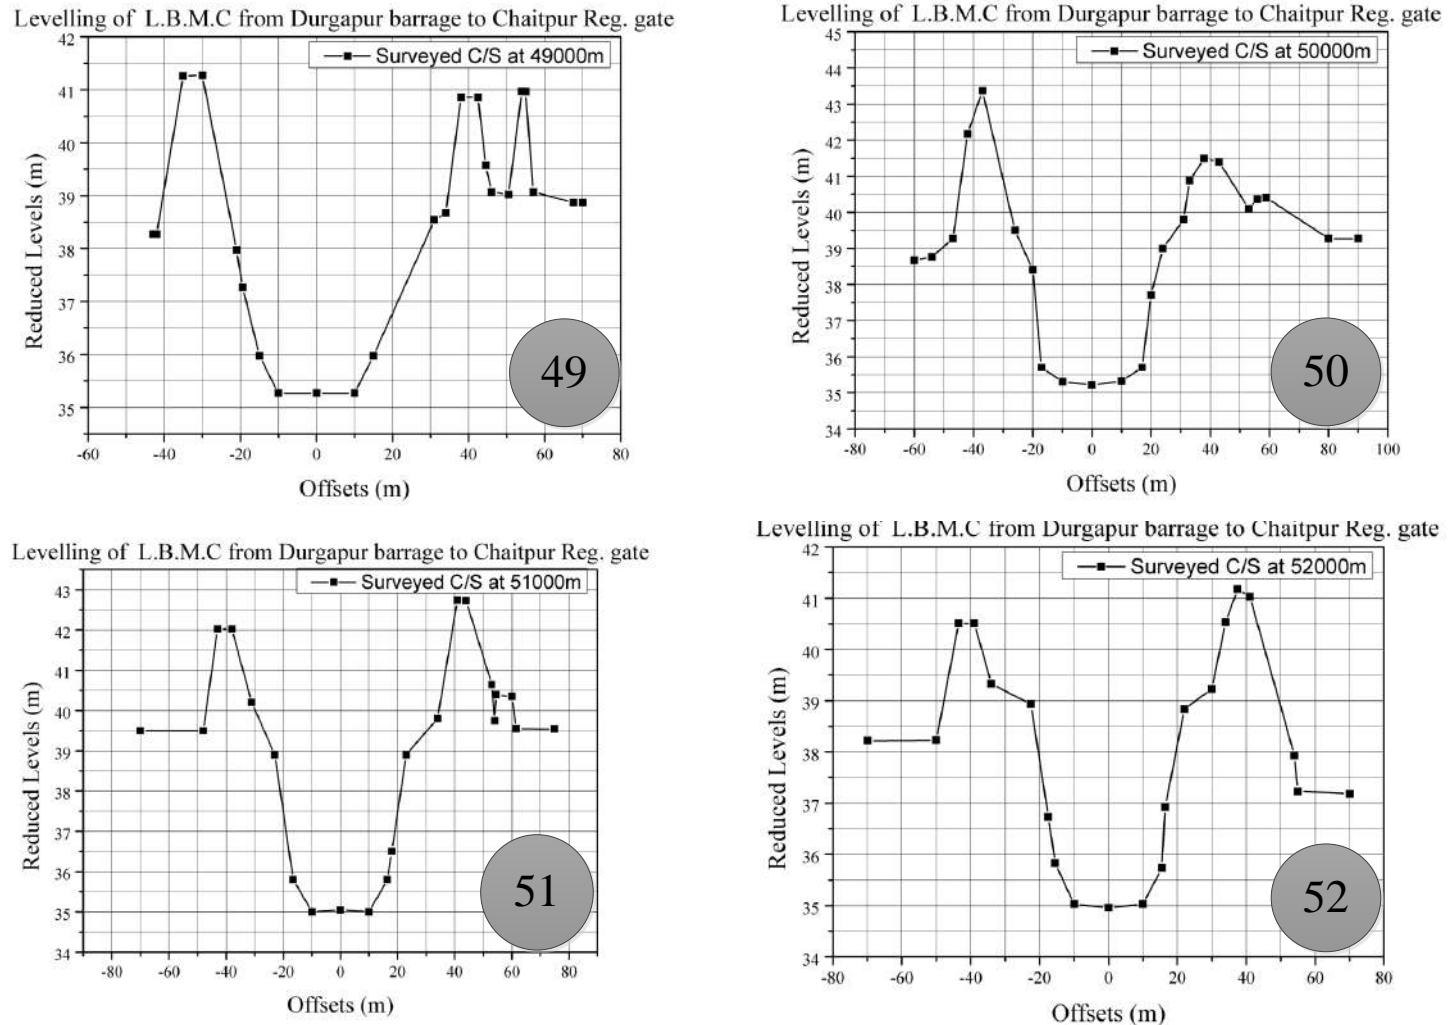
Canal cross section from 49 km to 52 km on Left Bank Main Canal
